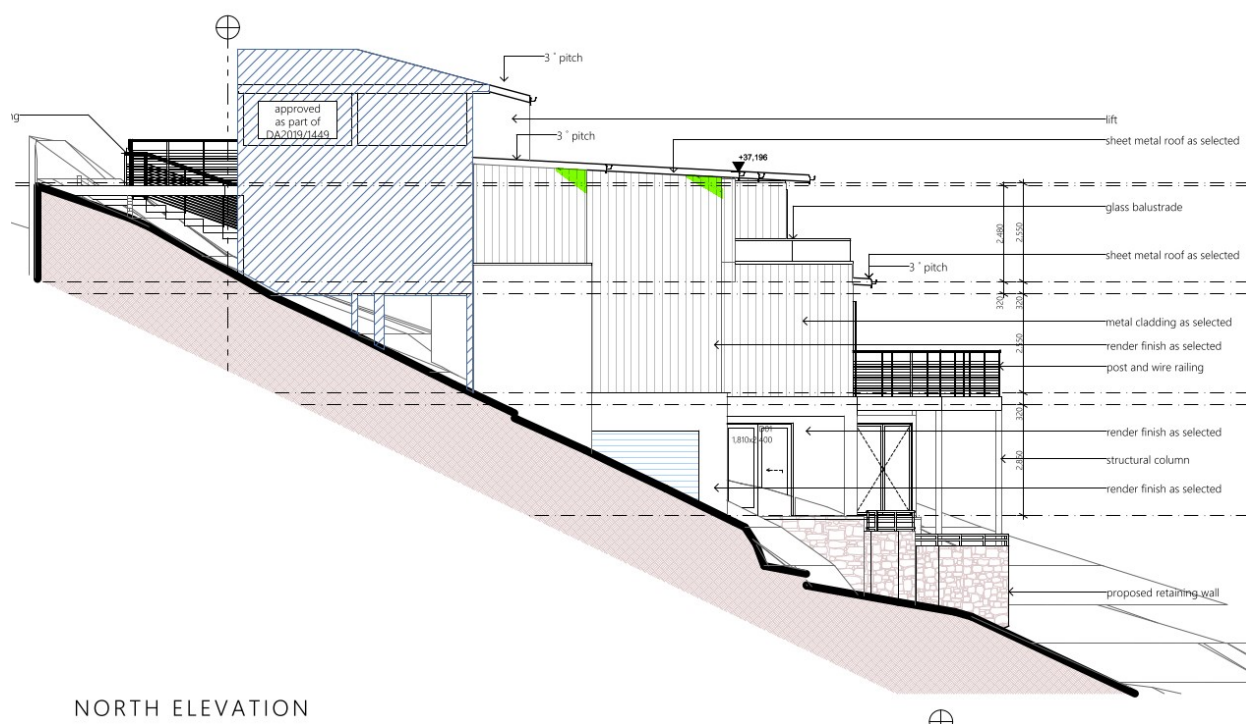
Proposed building envelope non-compliance on the northern elevation (highlighted in green).
